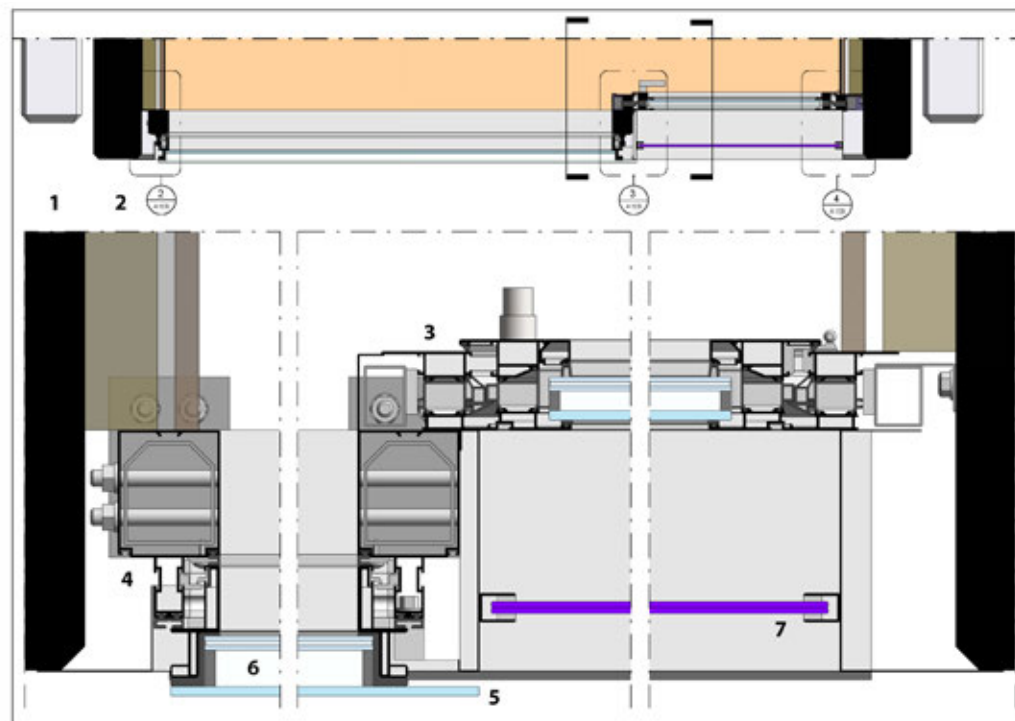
To reduce the visible part of the outline, the solution has been to overlap the façade glass to the window frame. 1- exposed reinforced concrete, 2- inner thermal insulation with wooden "boiserie", 3- window frame, 4-unit system façade, 5- outer glass extend overlapping the frame, 6- venetian blinds in double glass cavity, 7- colored laminated glass.
